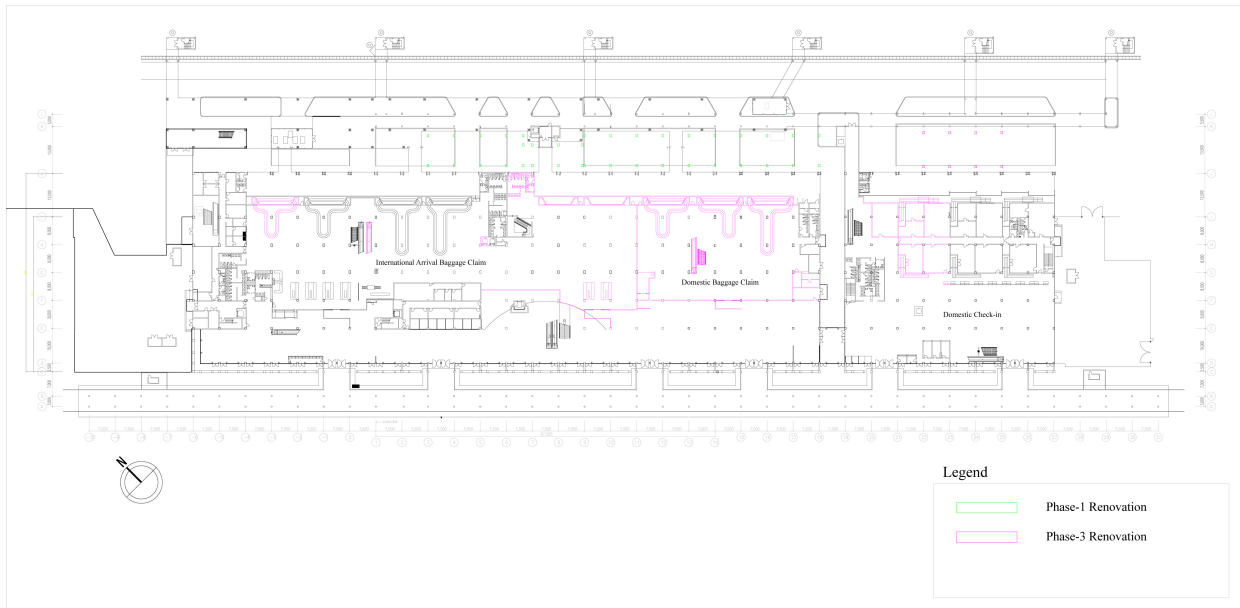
Phase-3 Renovation Plan of Passenger Terminal Building (1st Floor)
